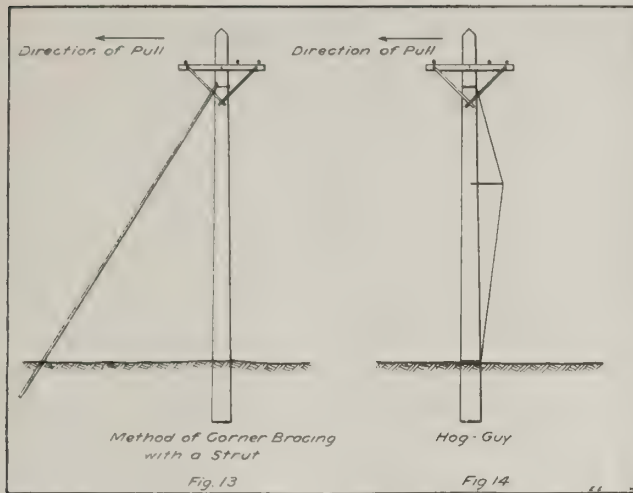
METHOD OF CORNER BRACING WITH A STRUT.
